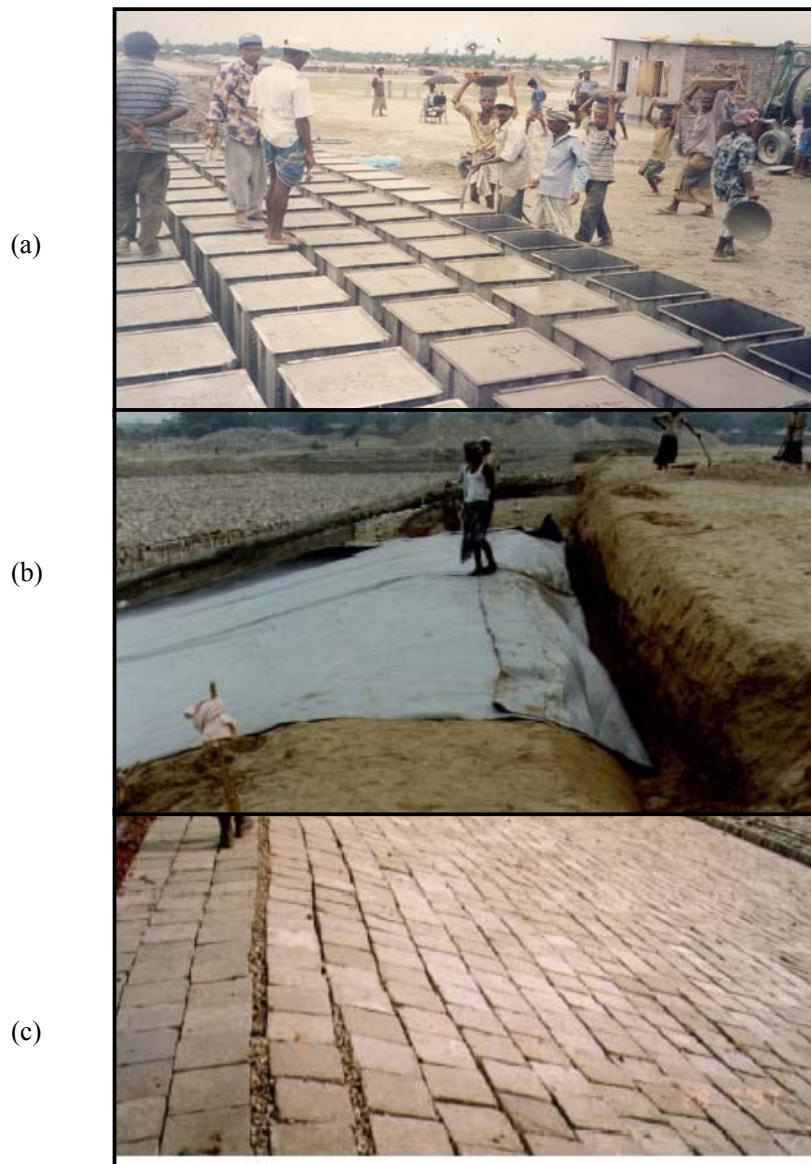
Manufacturing of CC-Blocks at the construction site: (a) blocks are numbered and counted properly; (b) laying geotextile mat; (c) placed CC blocks (revetment).
